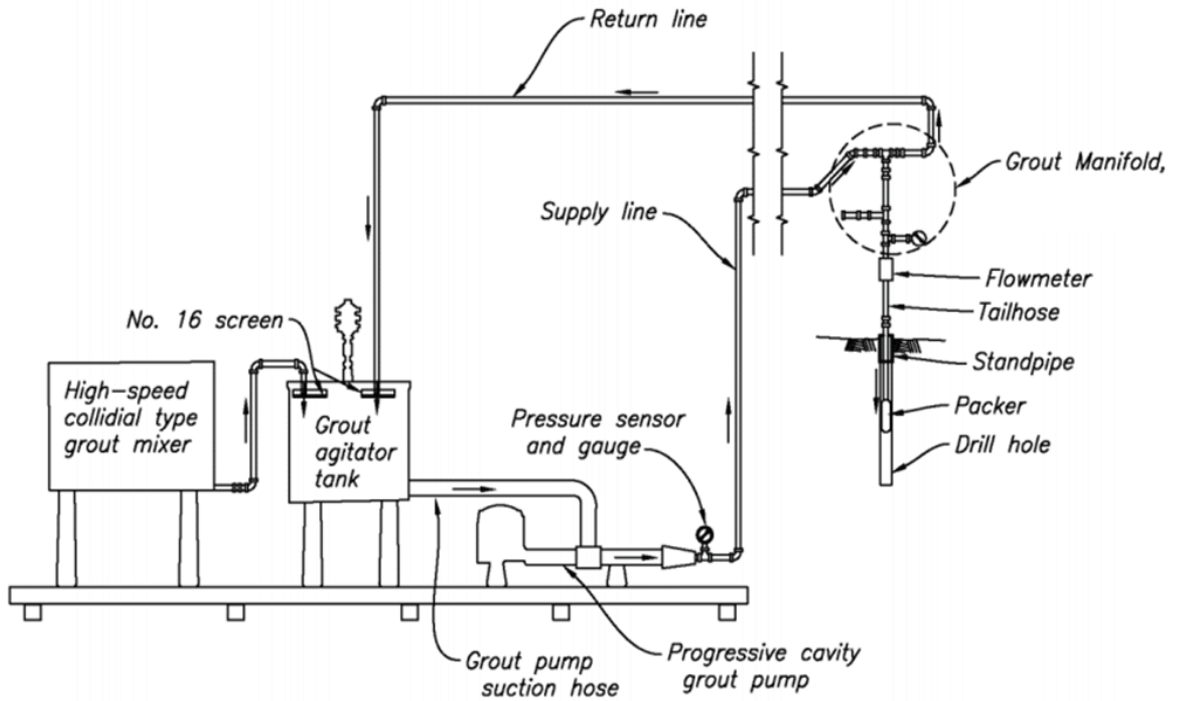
Schematic diagram of grouting (USBR, 2014).
